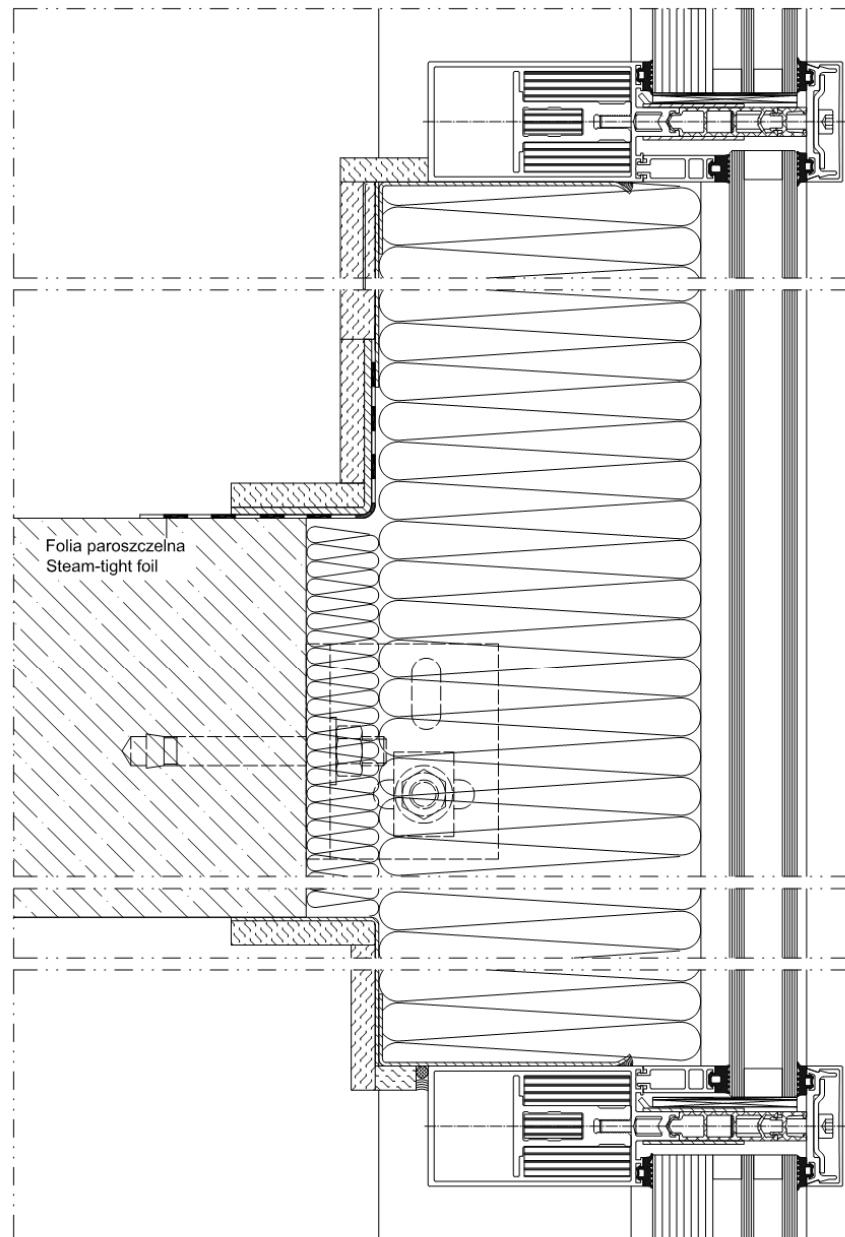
MB-SR50N EI EI60 system spandrel solution - vertical cross section
